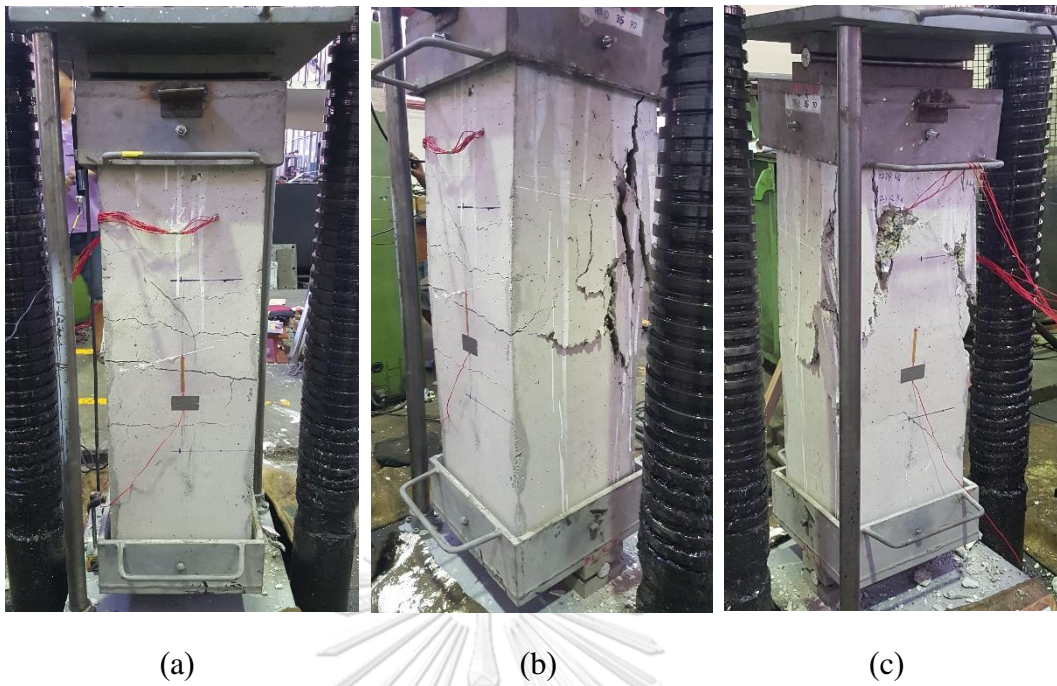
Failure of CECS column C1s-63-E1; (a) tension side; (b) side view; and (c) compression side.
